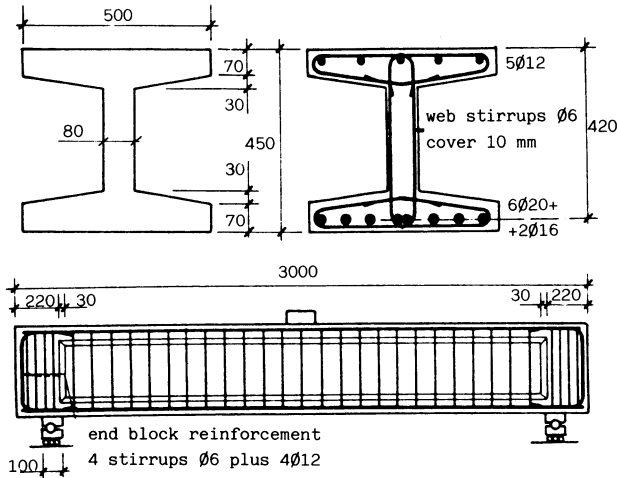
Details of the beams tested by Regan and Rezai-Jorabi [14]: beams 1-3. Flange stirrups ϕ 6 spacing 100 mm in beams 1-3; 175 mm in beams 4-6; 70 mm in beams 7-9.
